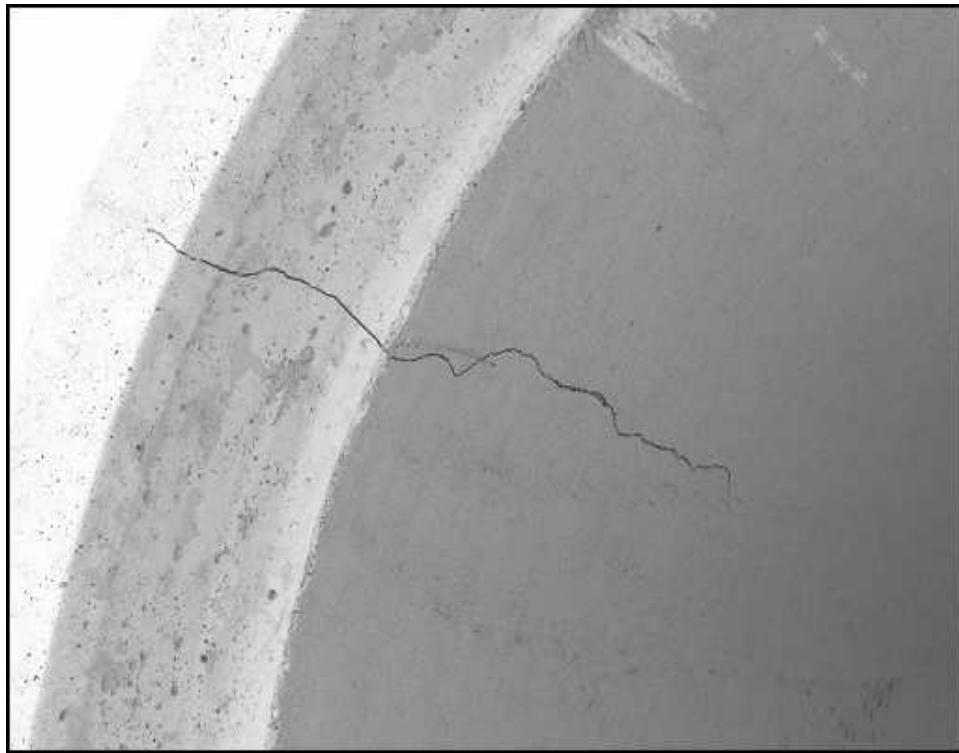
Crack depth estimation from the one end of a concrete pipe specimen.
